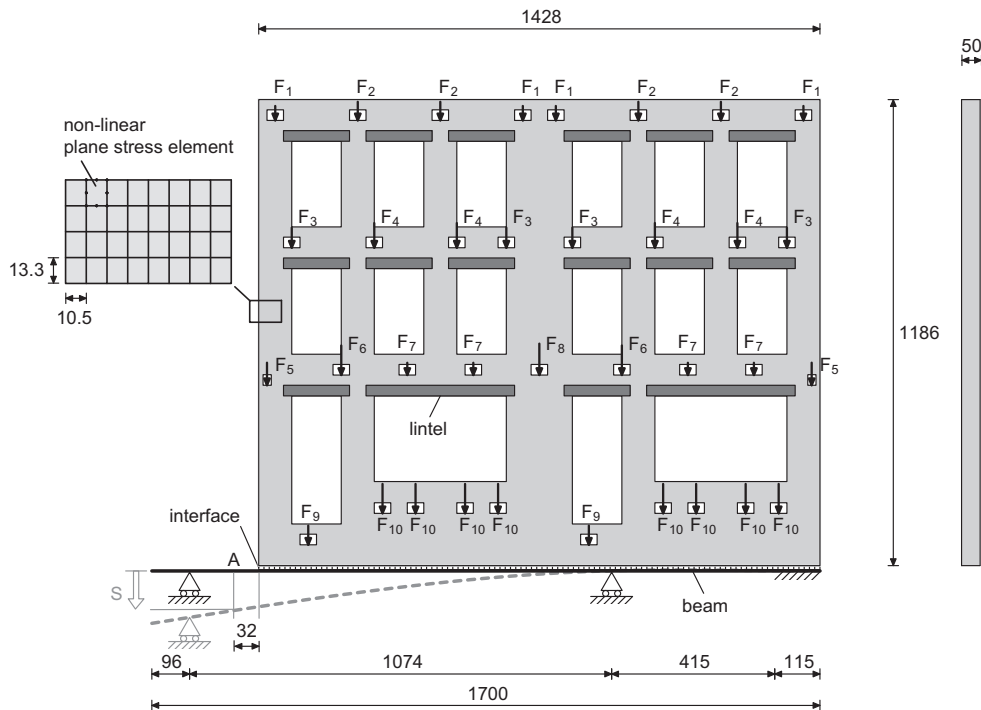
Model of the scaled masonry façade. All dimensions are in mm.
